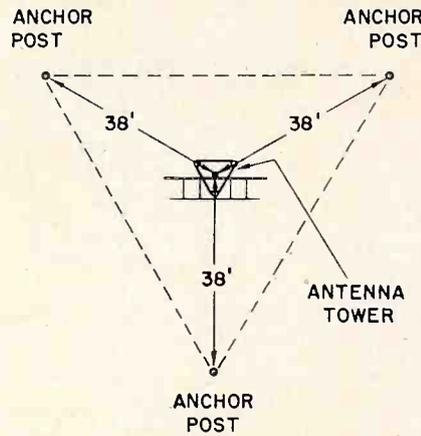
Anchor post location plan, showing the equilateral triangle formed by the three anchor posts.
